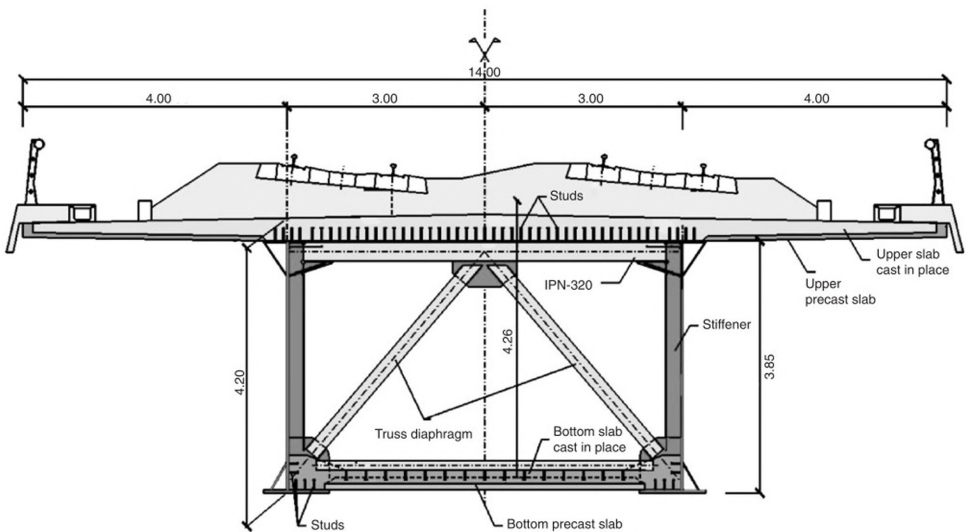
Hogging cross-section. Steel-concrete composite solution (63.50 meters span).
